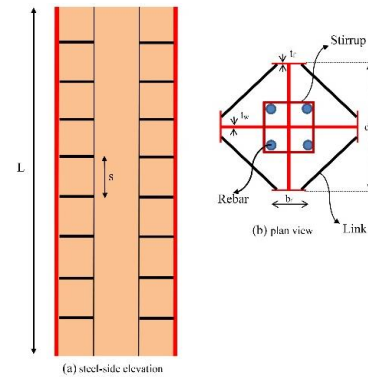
(a) elevation scheme, and (b) plan view of PEC column
